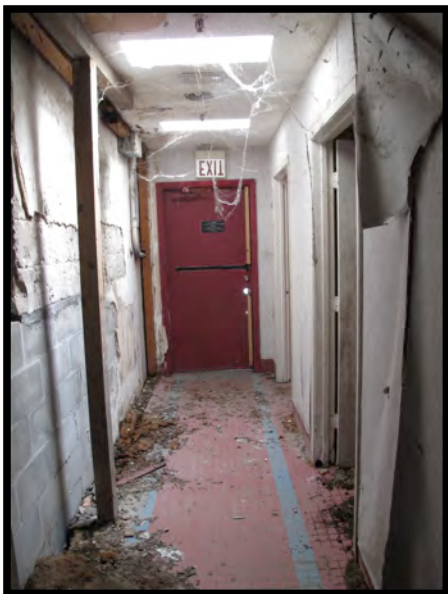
(left) On the ground floor in the connected outbuilding, facing the northwest corner.
